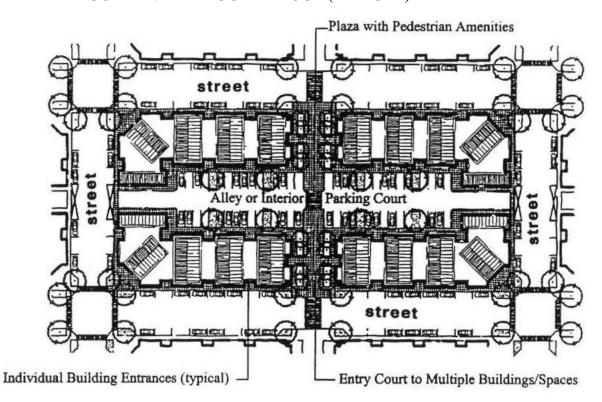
B-1 BLOCK LAYOUT (TYPICAL)
